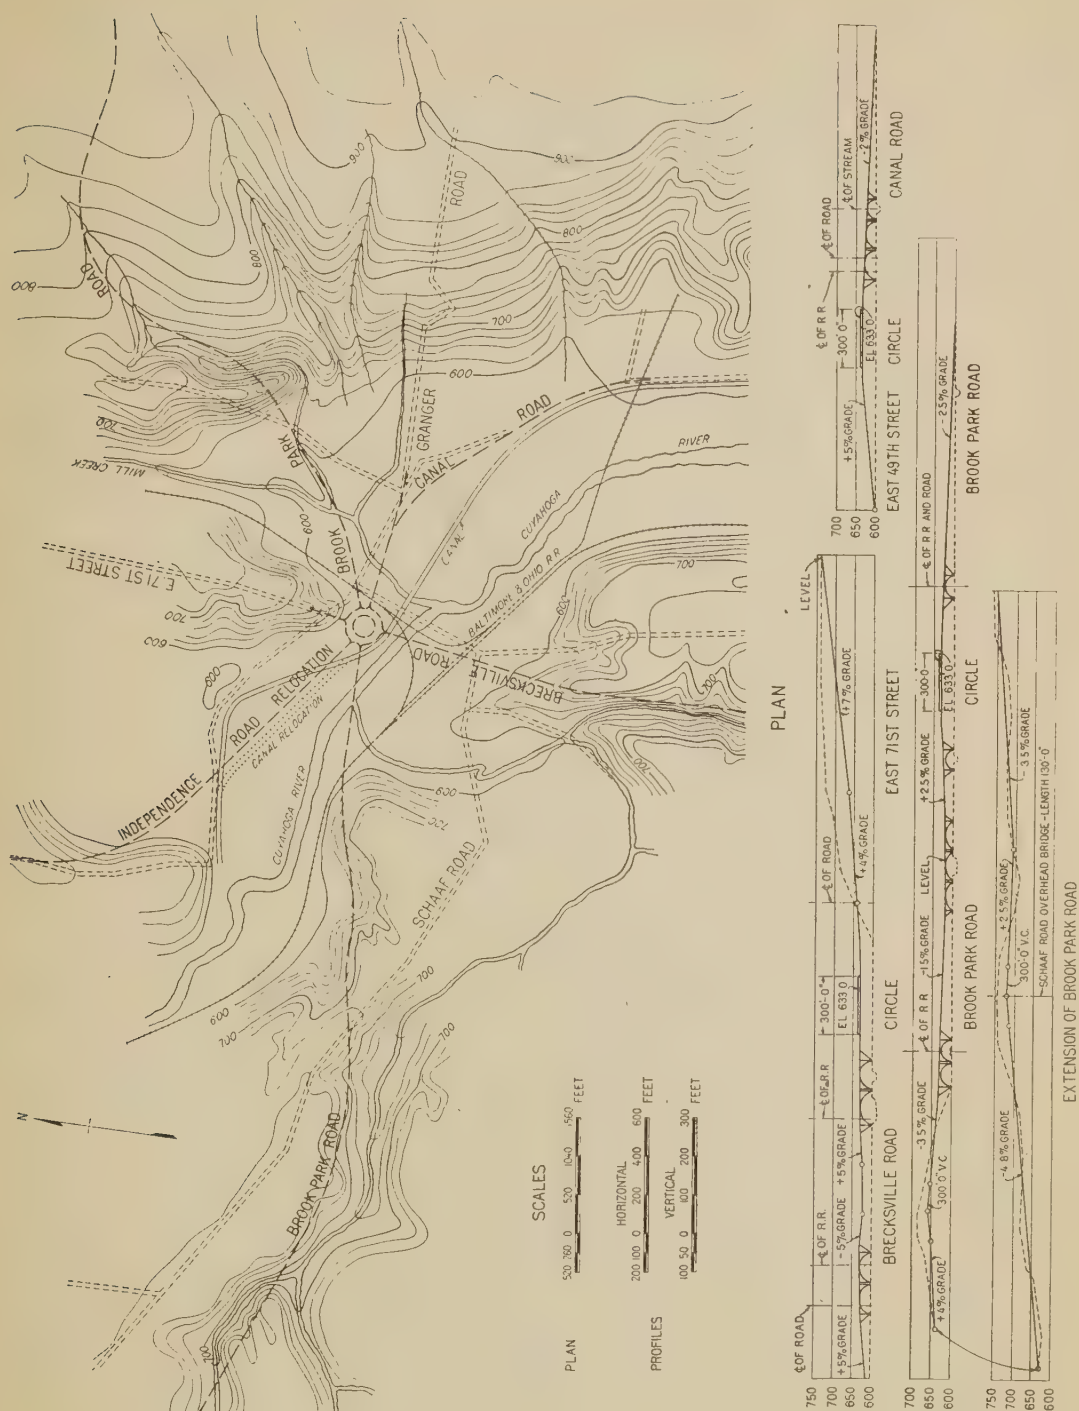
Study of the proposed circular intersection of East 71st Street, Independence Road, Brook Park extension, Brecksville Road, Canal Road, and Warner Road
